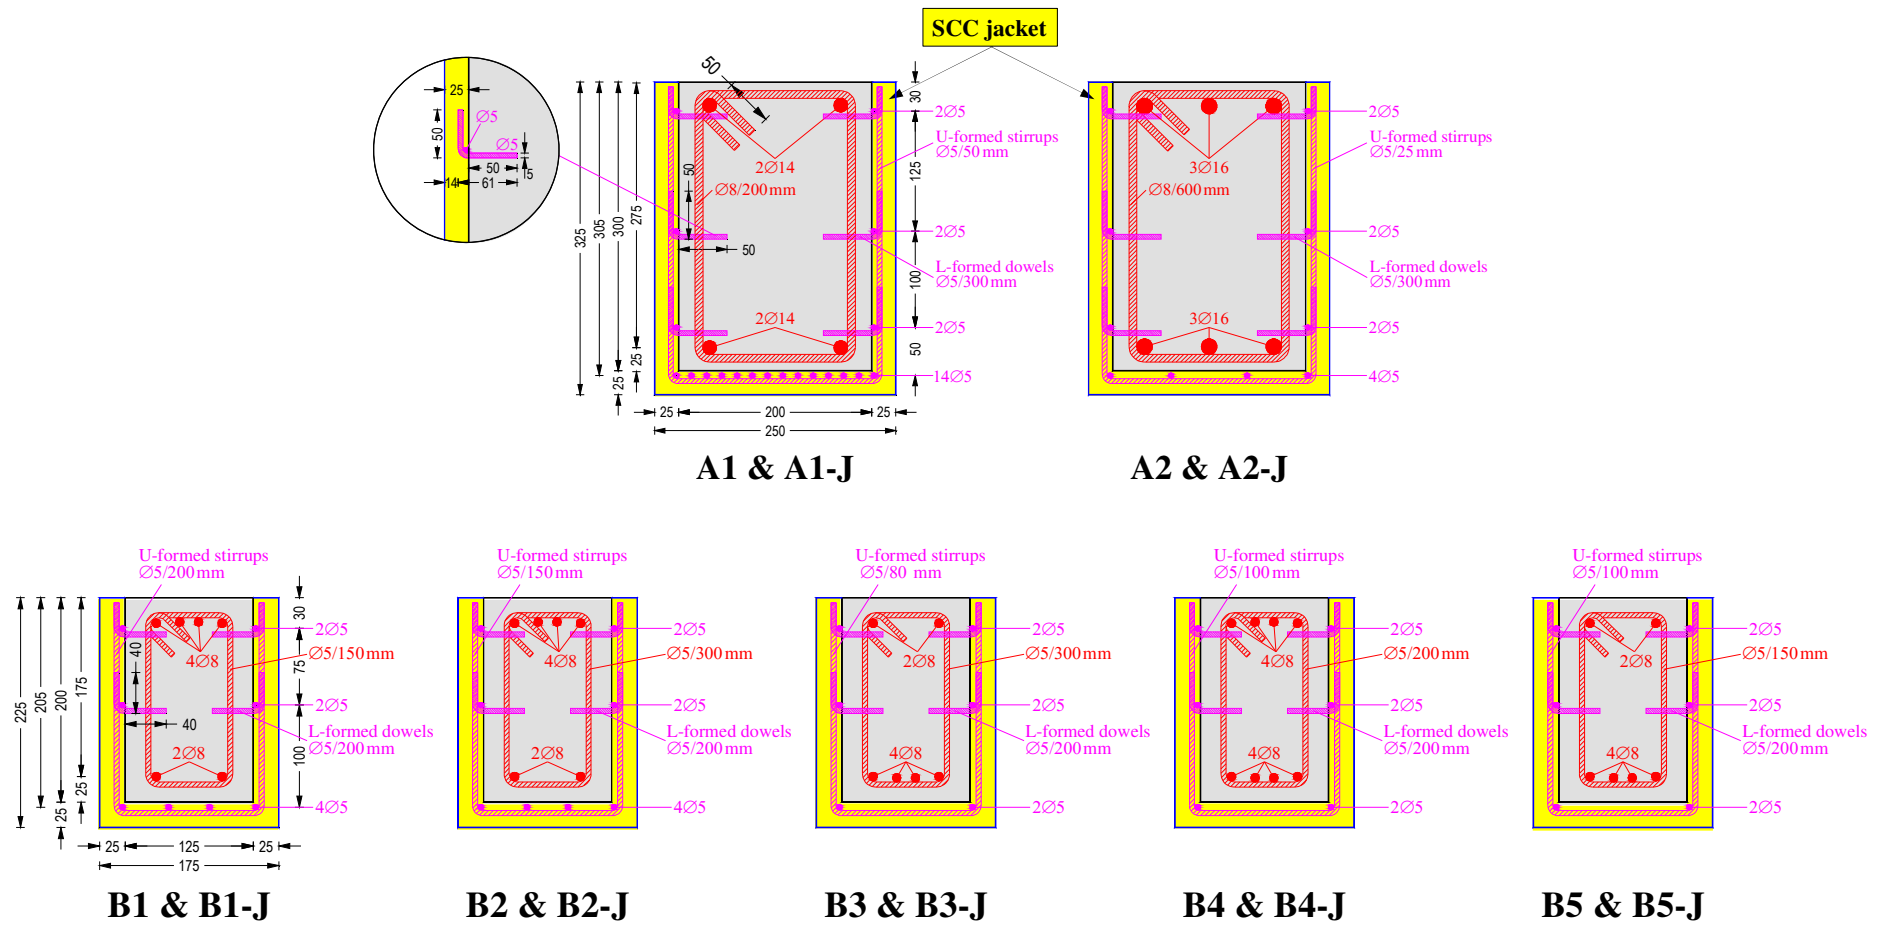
(b) Cross-sectional and steel reinforcement details of the tested beams.
